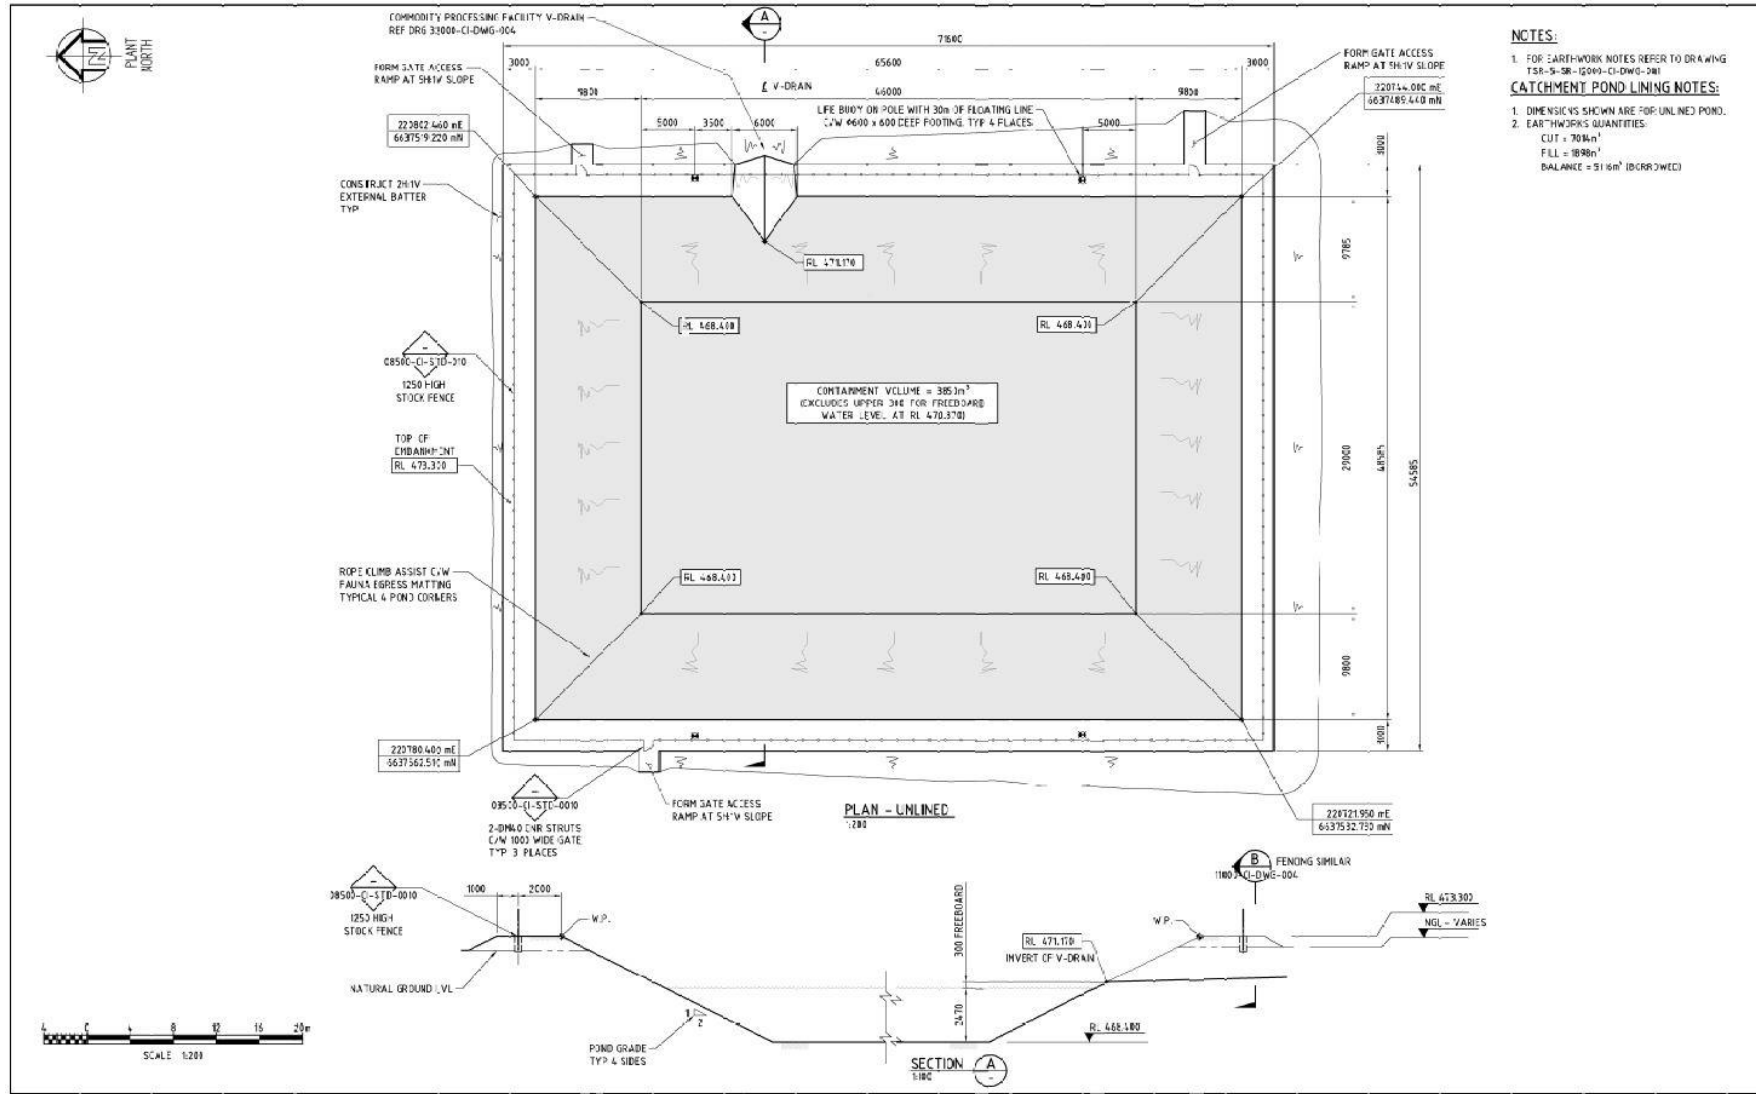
Temporary Waste Storage Area – stormwater pond construction detail
